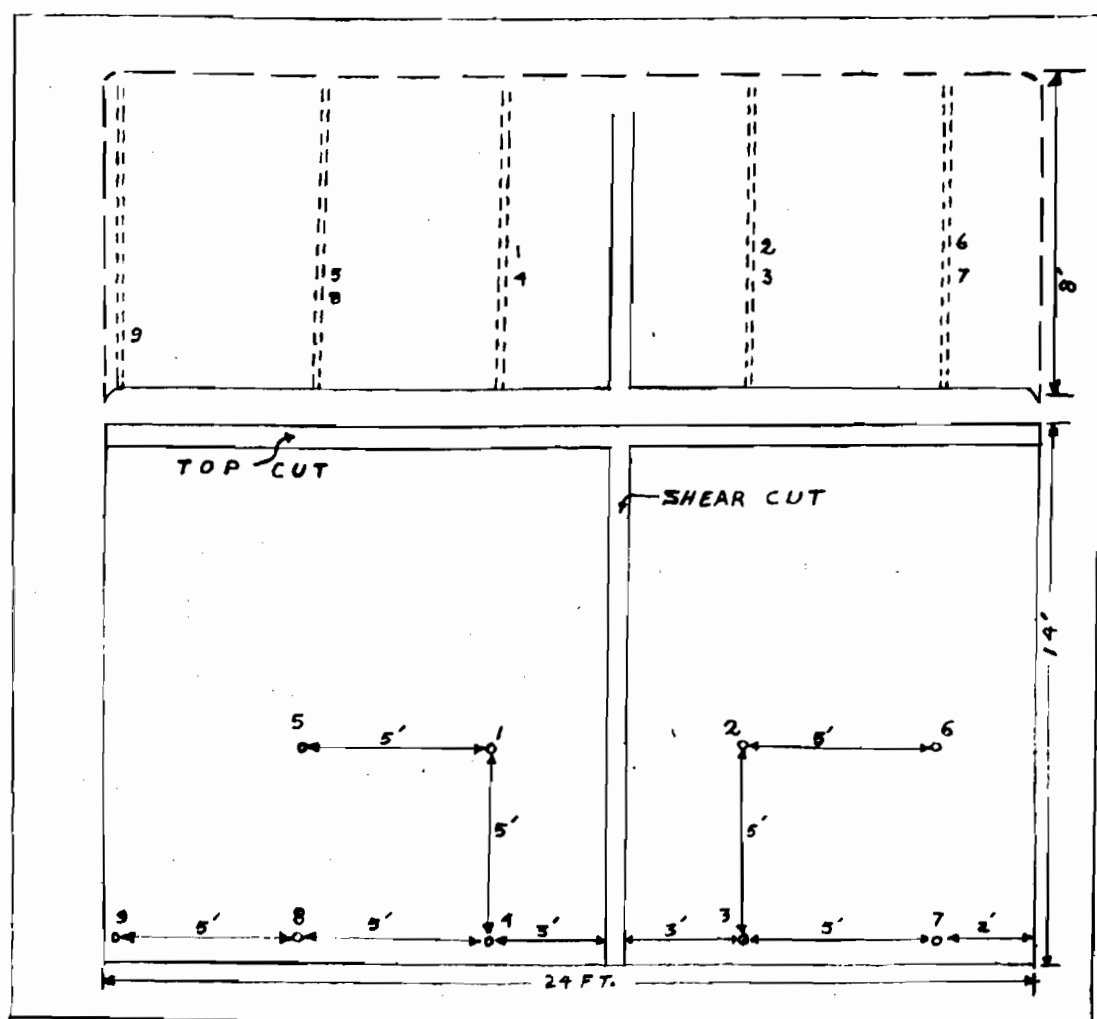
DRILLING PLAN. NUMBERS DENOTE ORDER OF SHOOTING. D.O. CLARK MINE.
